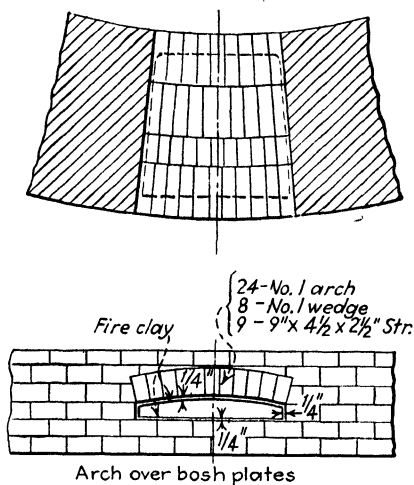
Arch over bosh plates. (Courtesy of Freyn Engineering Company.)
